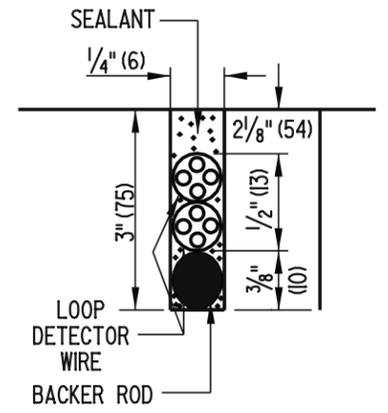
DETAILS FOR INSTALLING LOOP DETECTOR WIRE (SINGLE WRAP)
